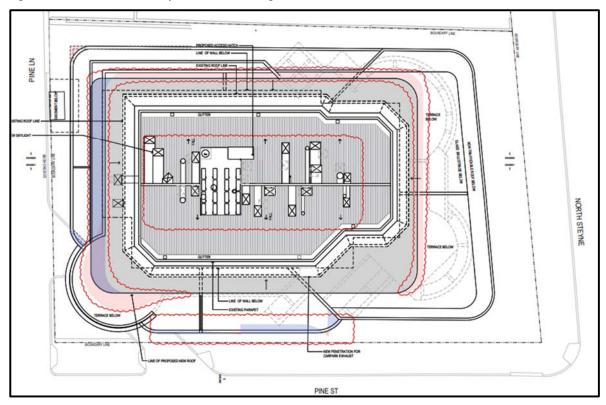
s4.55 Roof Plan; Squillace, Issue B, August 2021
